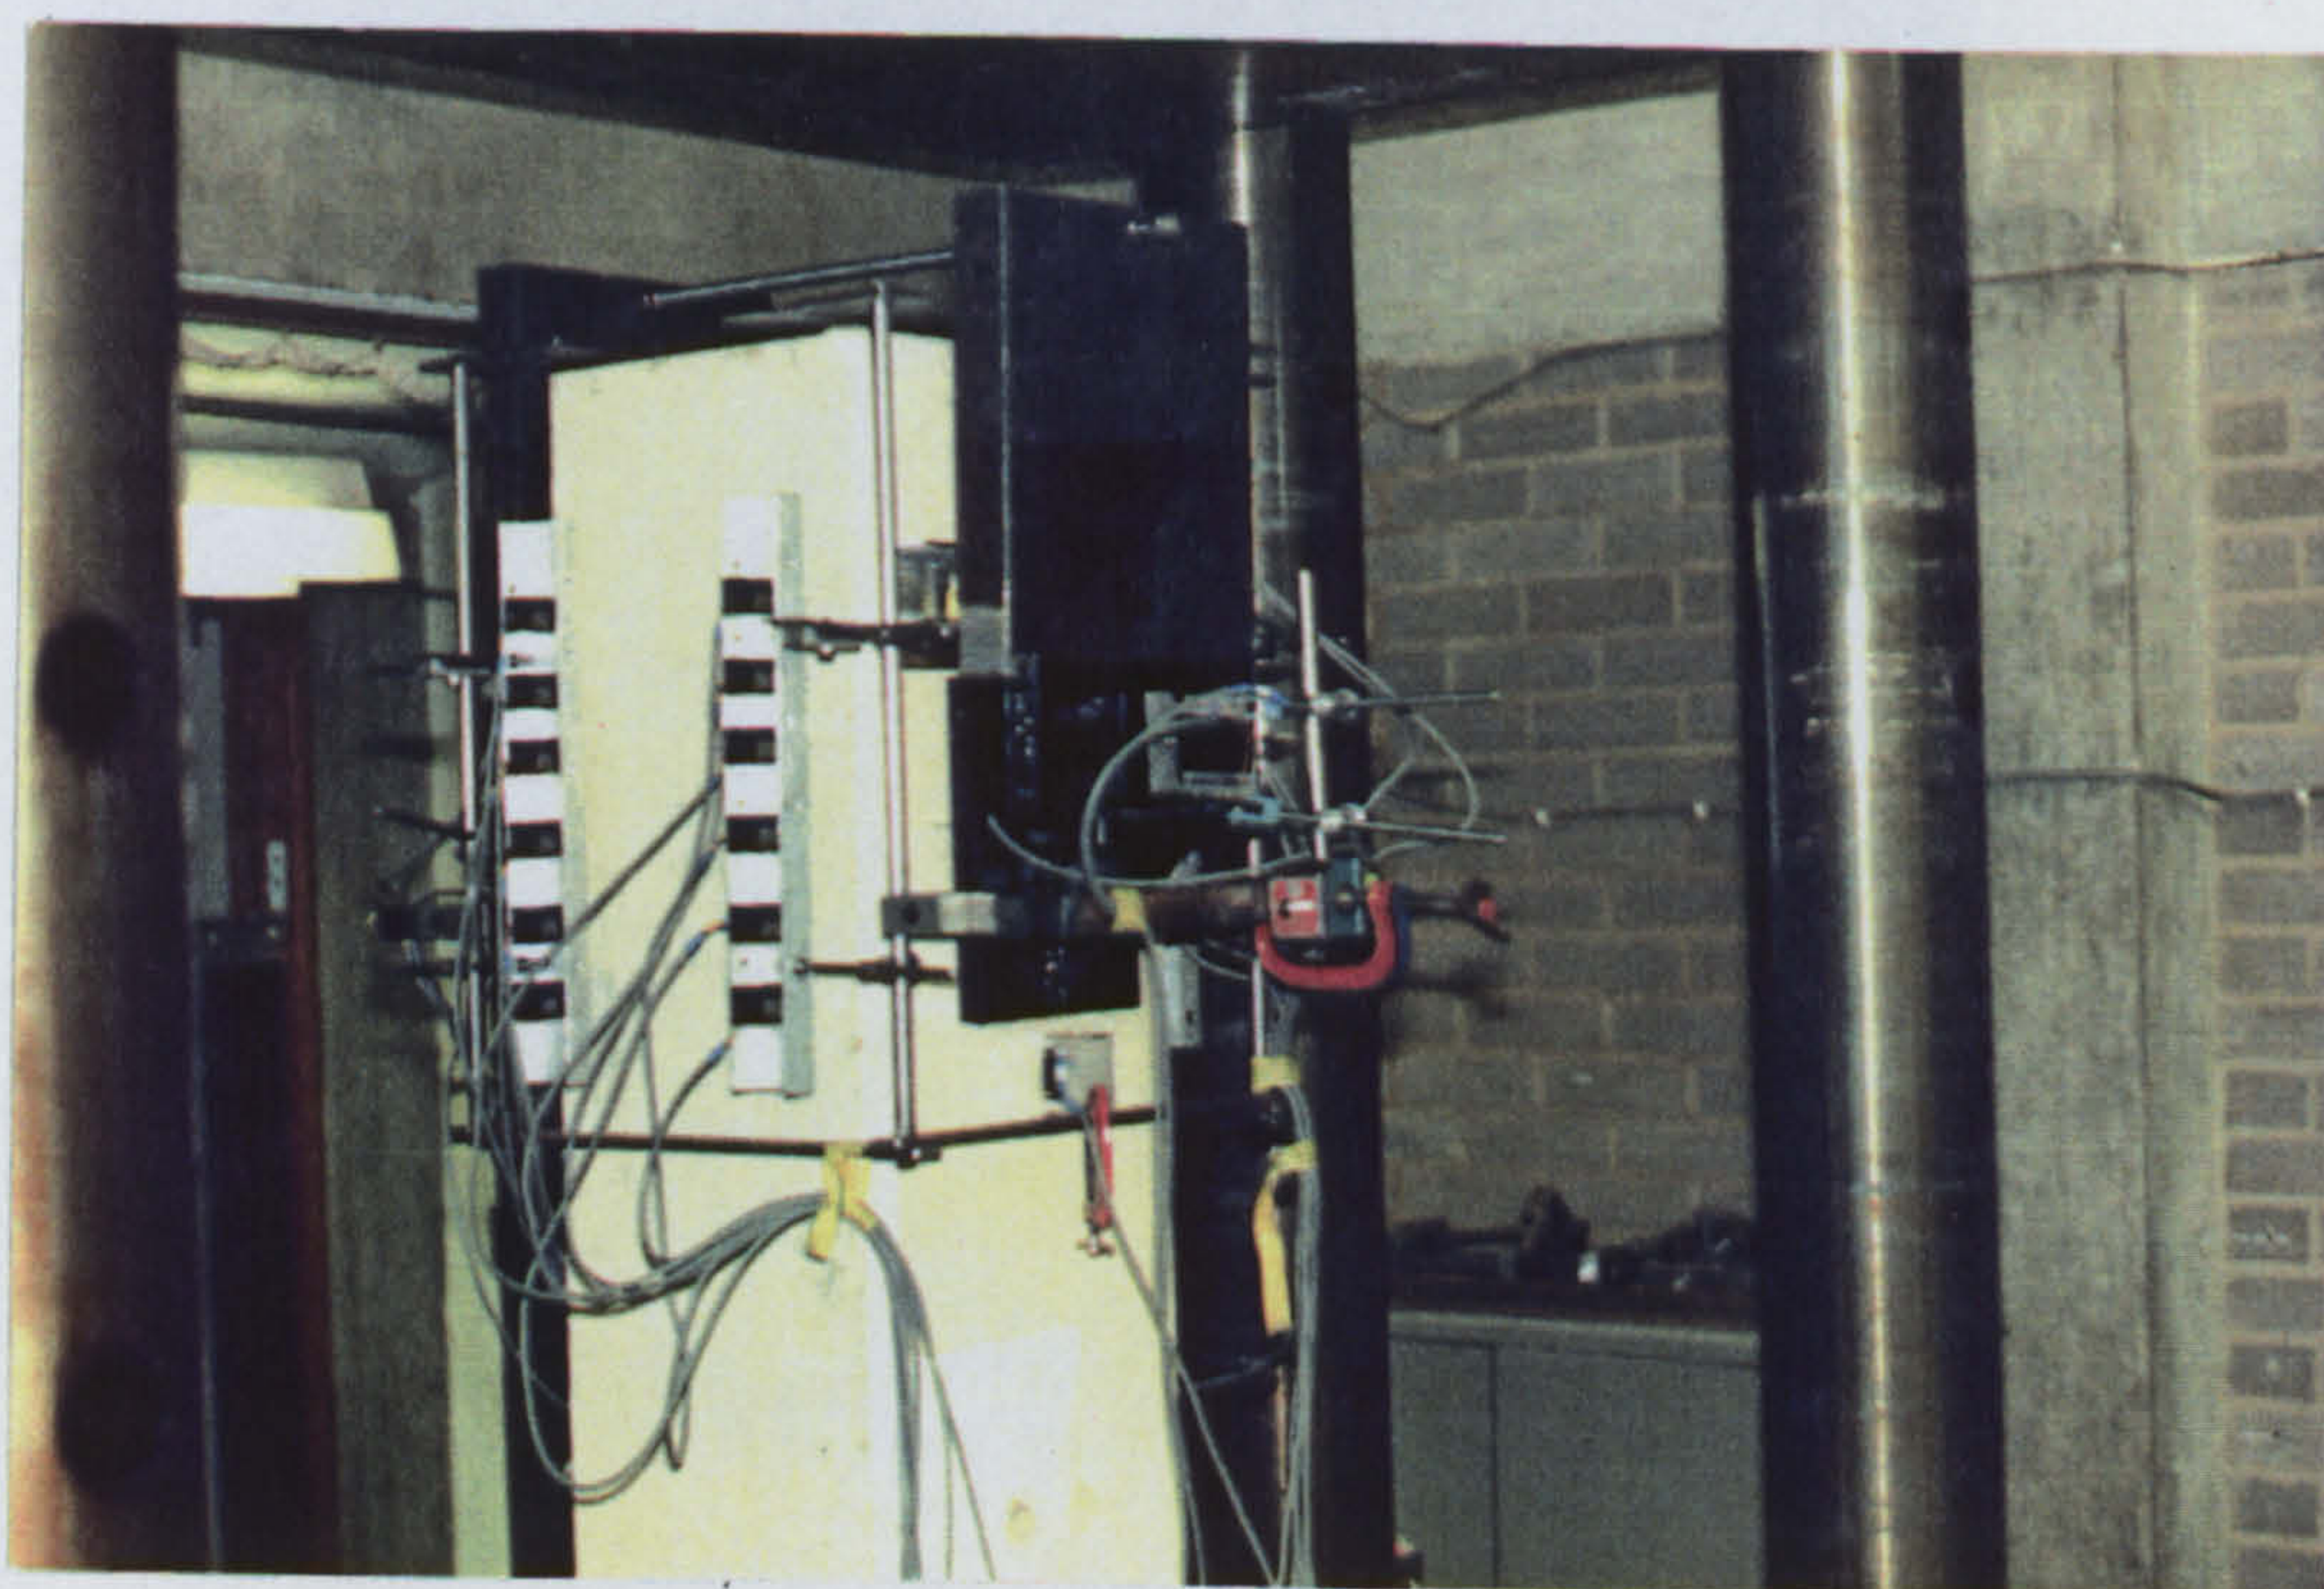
ILLUSTRATION OF TEST ASSEMBLY FOR A SINGLE-BOLTED JOINT
